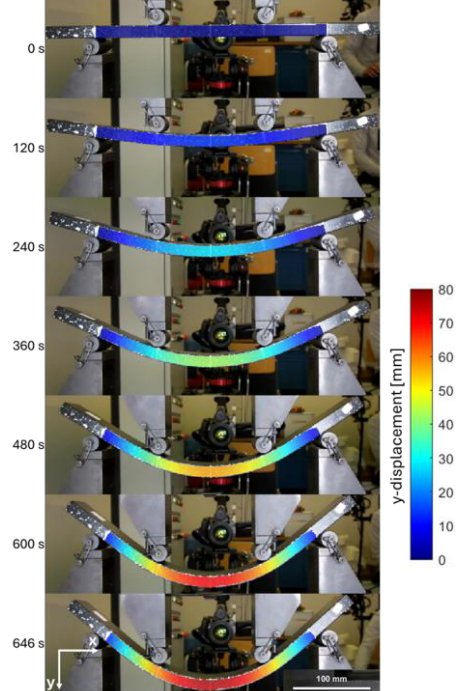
DIC images of the specimen VB15-9 during the bending test.
